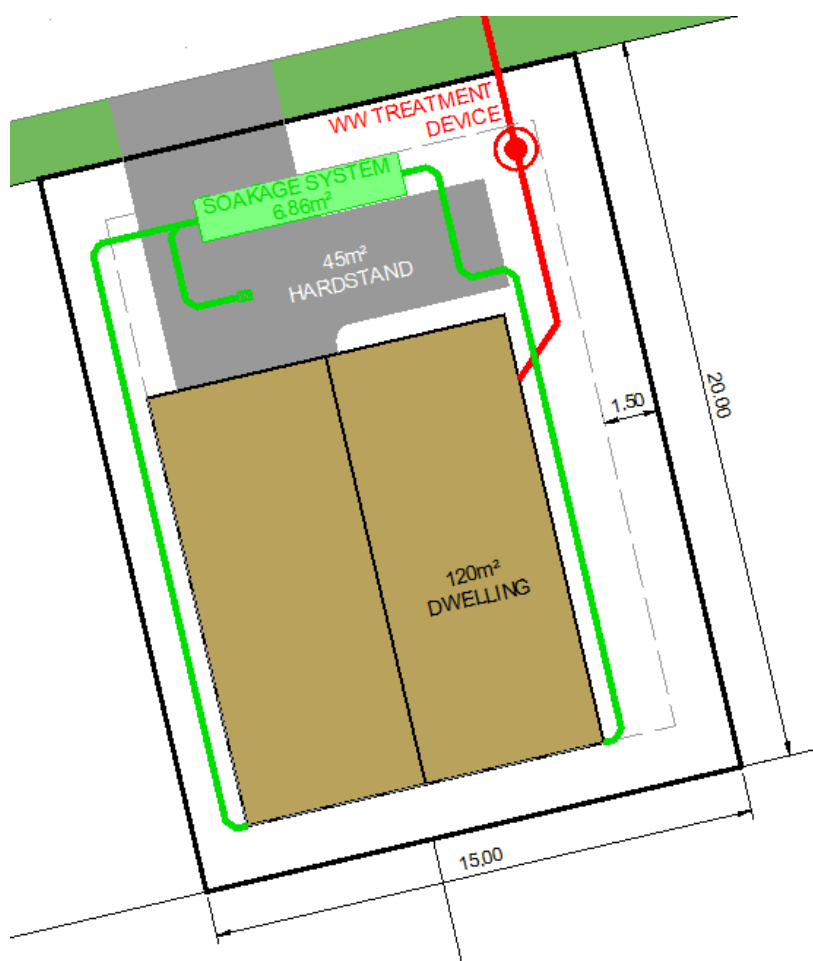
Sample lot layout, showing how a stormwater soakage system and wastewater treatment device can be sited within a 300m² lot.
